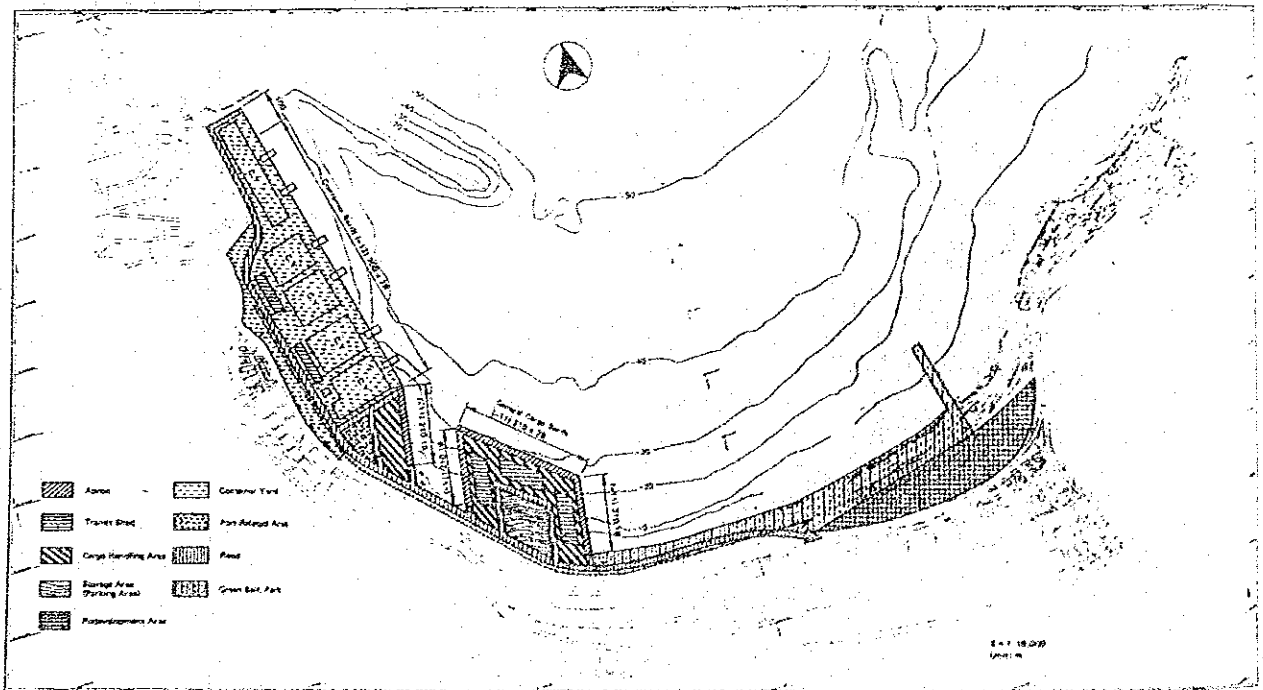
Master Plan of Valparaiso Port (2010) Plan D
